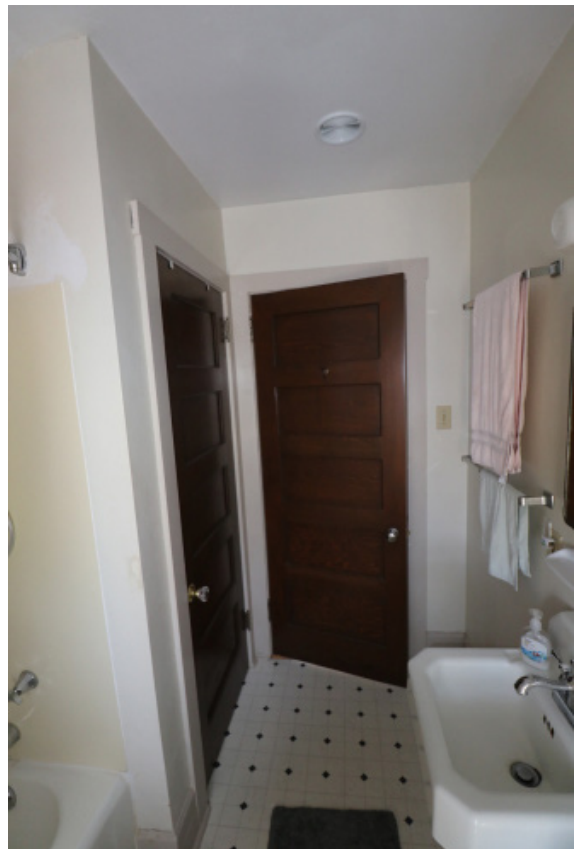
D-150 Bathroom #1 in the second floor apartment, east part.
